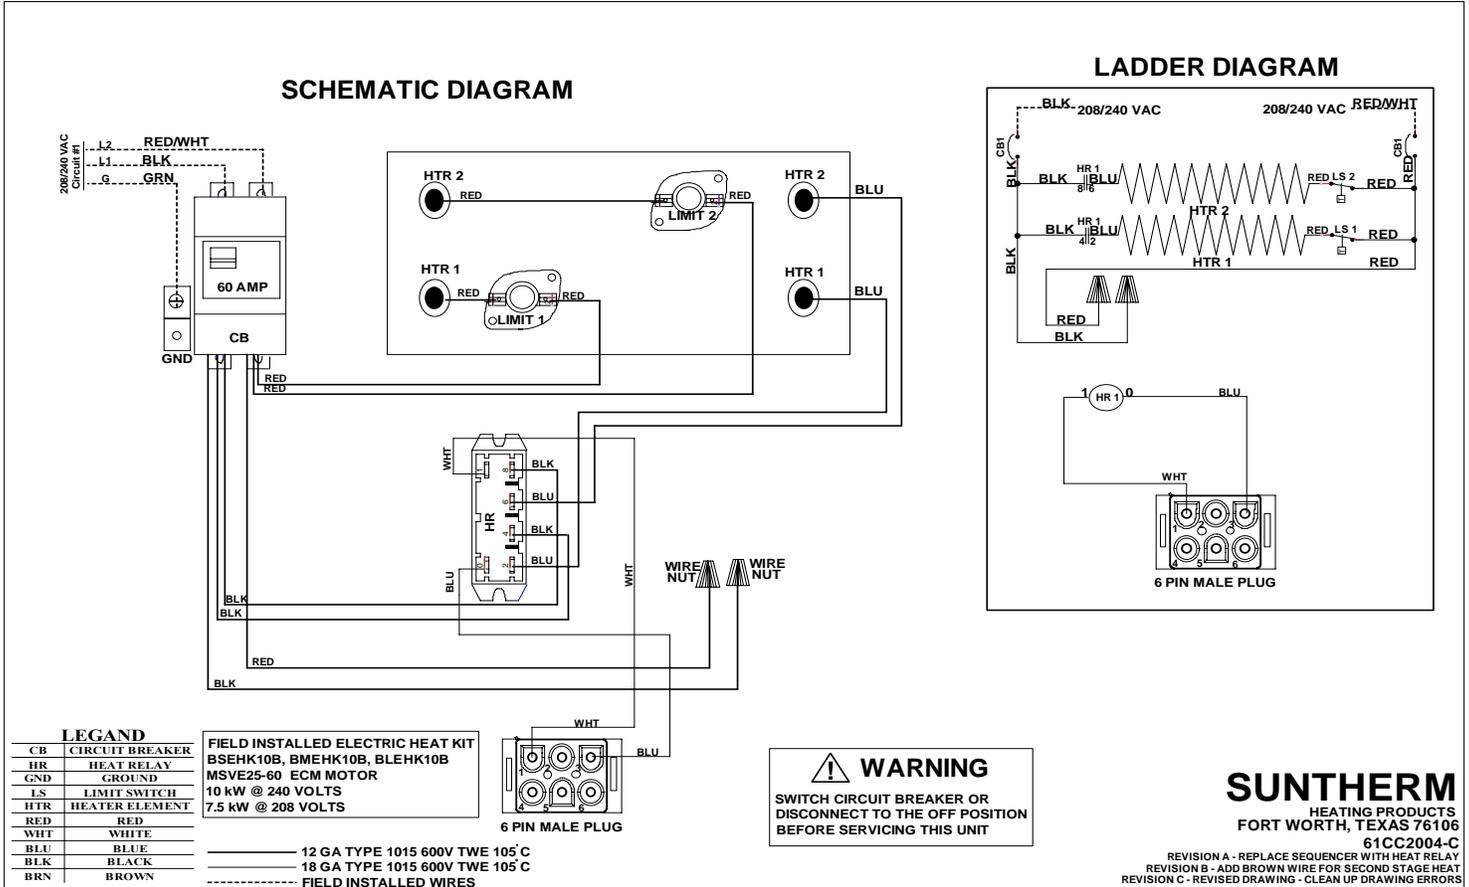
MMVE 18-72 - ECM 2.3 - 10 kW Field Installed Heater Kit
